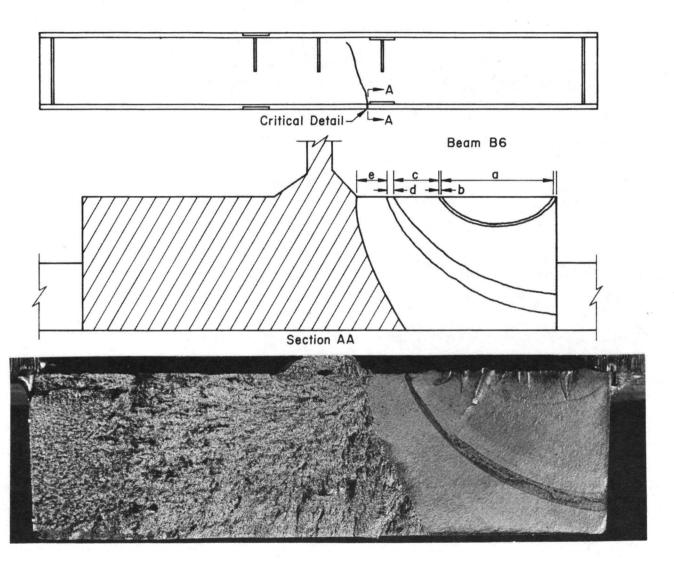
Fatigue and Fracture Surface, B6 (A588)
